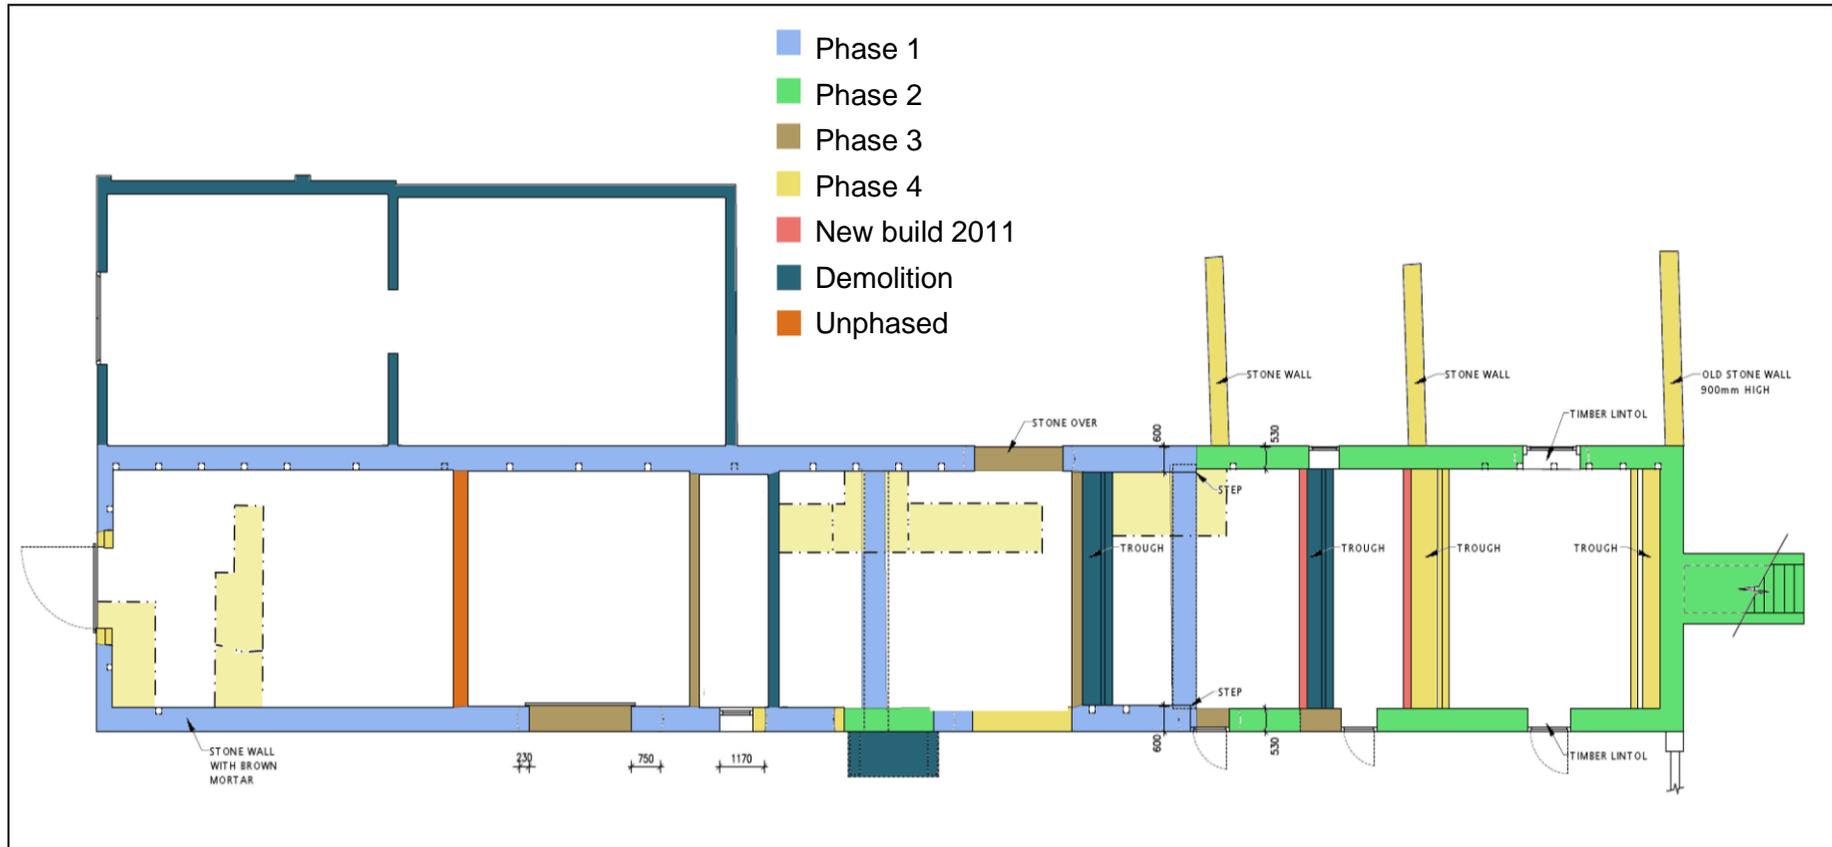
Phased plan of stable building showing demolition, new construction and the unphased wall between rooms 1 and 2 (Adapted from Clift & Smuts 2010: 23).
